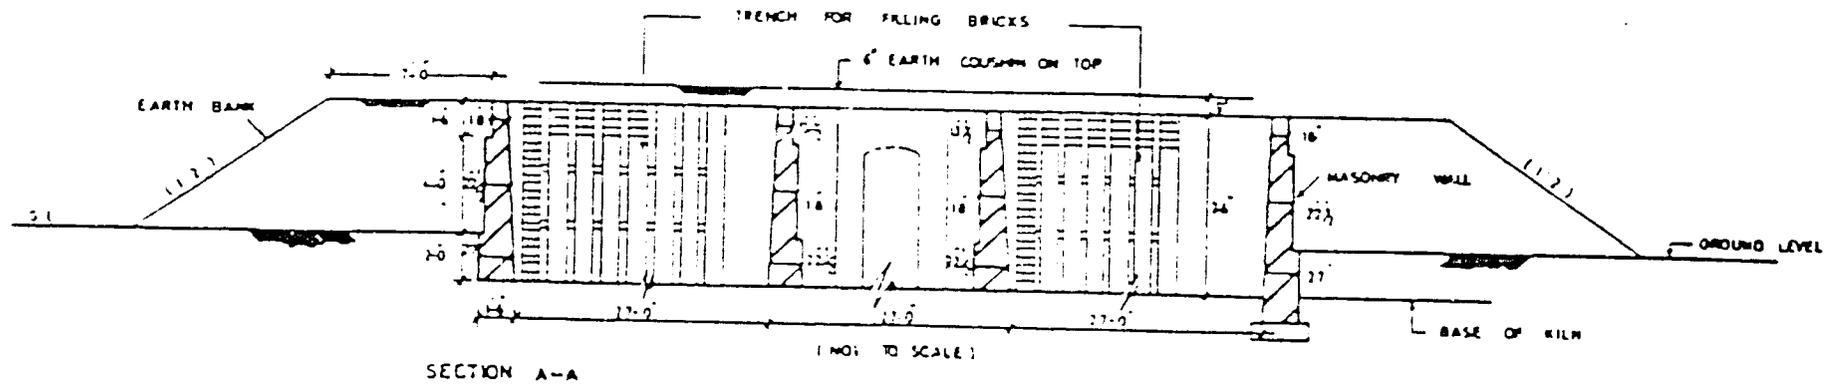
Typical details of Bull's Trench kiln having capacity of one million bricks.
